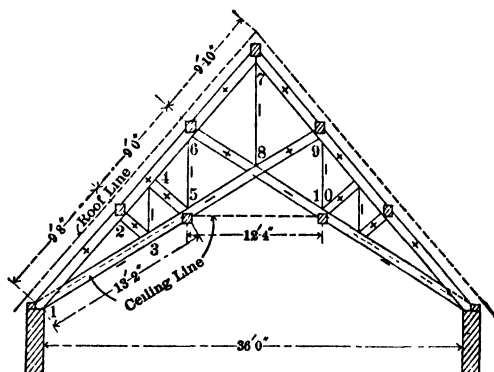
Scissors Truss. Spans Exceeding Thirty Feet
